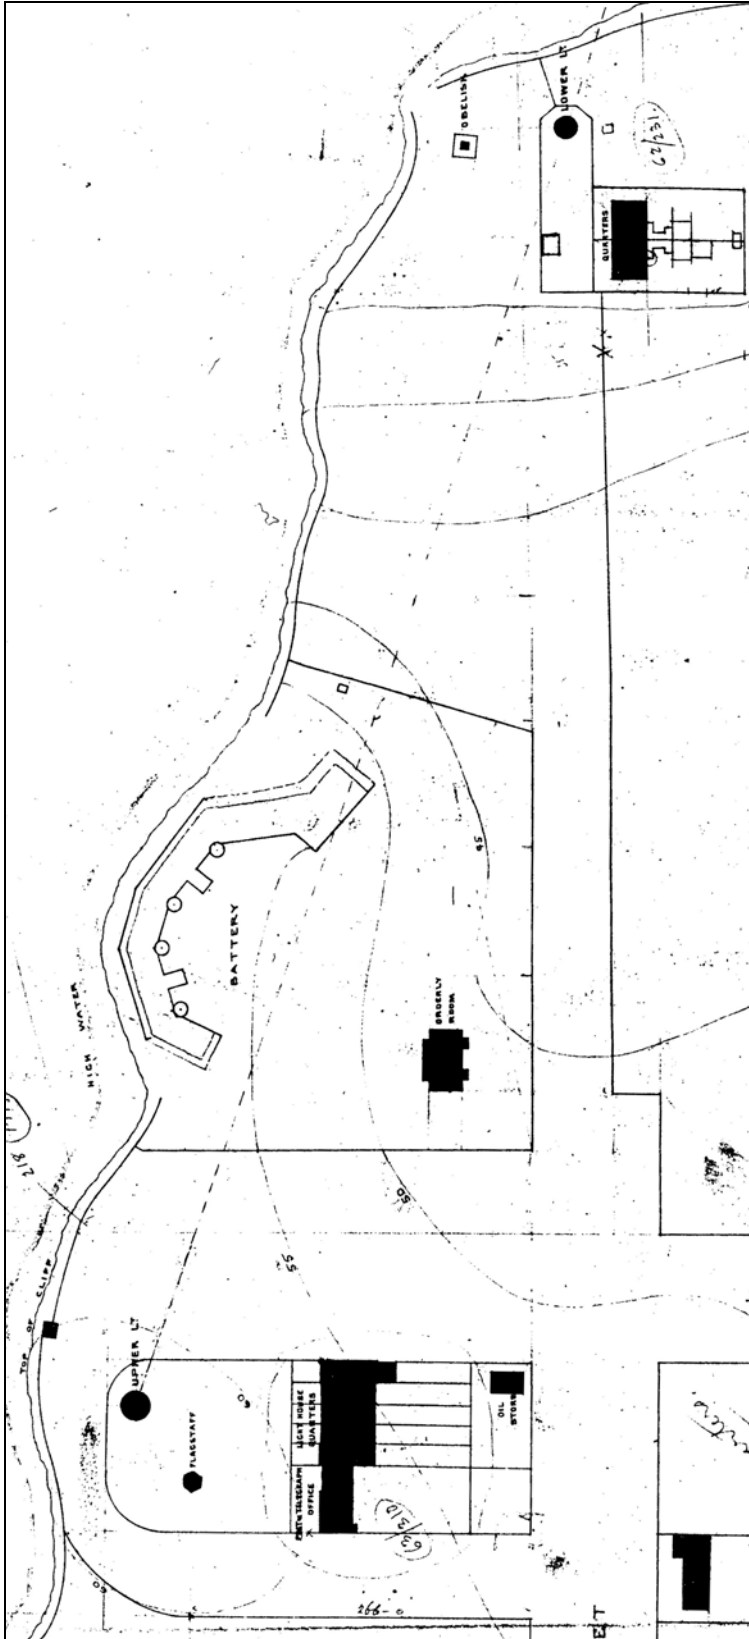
11: Shortland's Bluff Lighthouses 1877 (PWD c. 1877 [plan], QHM Collection).
